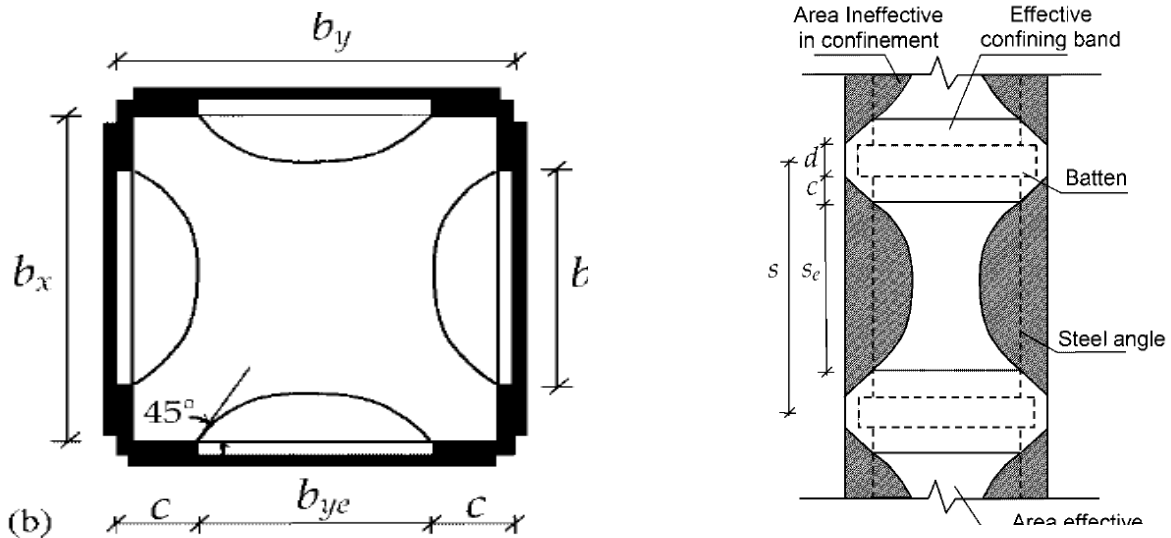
Confinement of RC column due to steel caging in plan and elevation.
